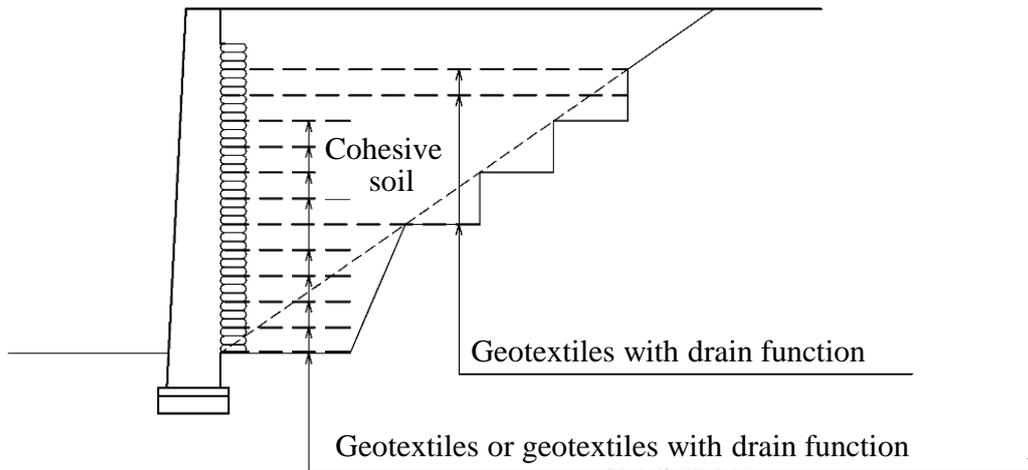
Cross-section of RRR-B in case of cohesive soil embankment
